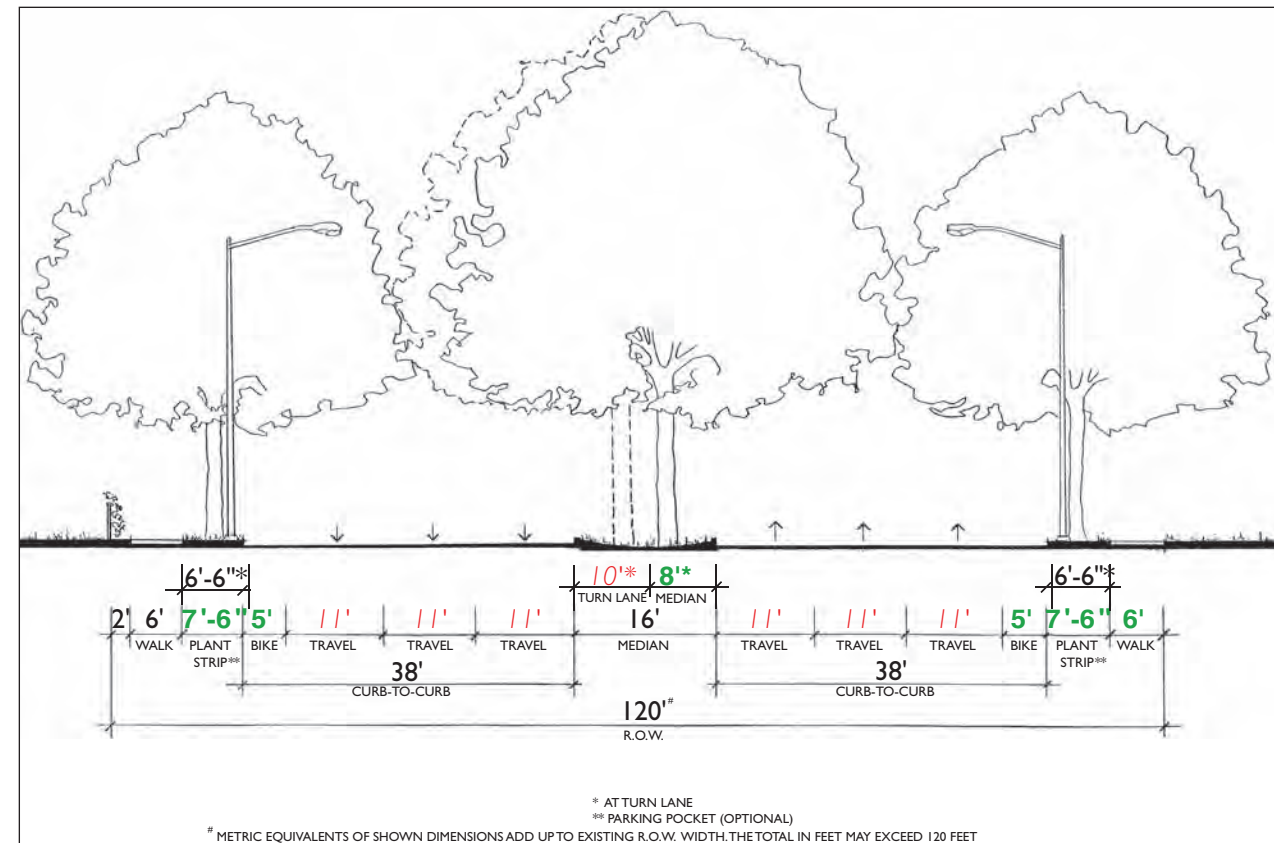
Typical ‘Stanford’ 6-lane cross-section
